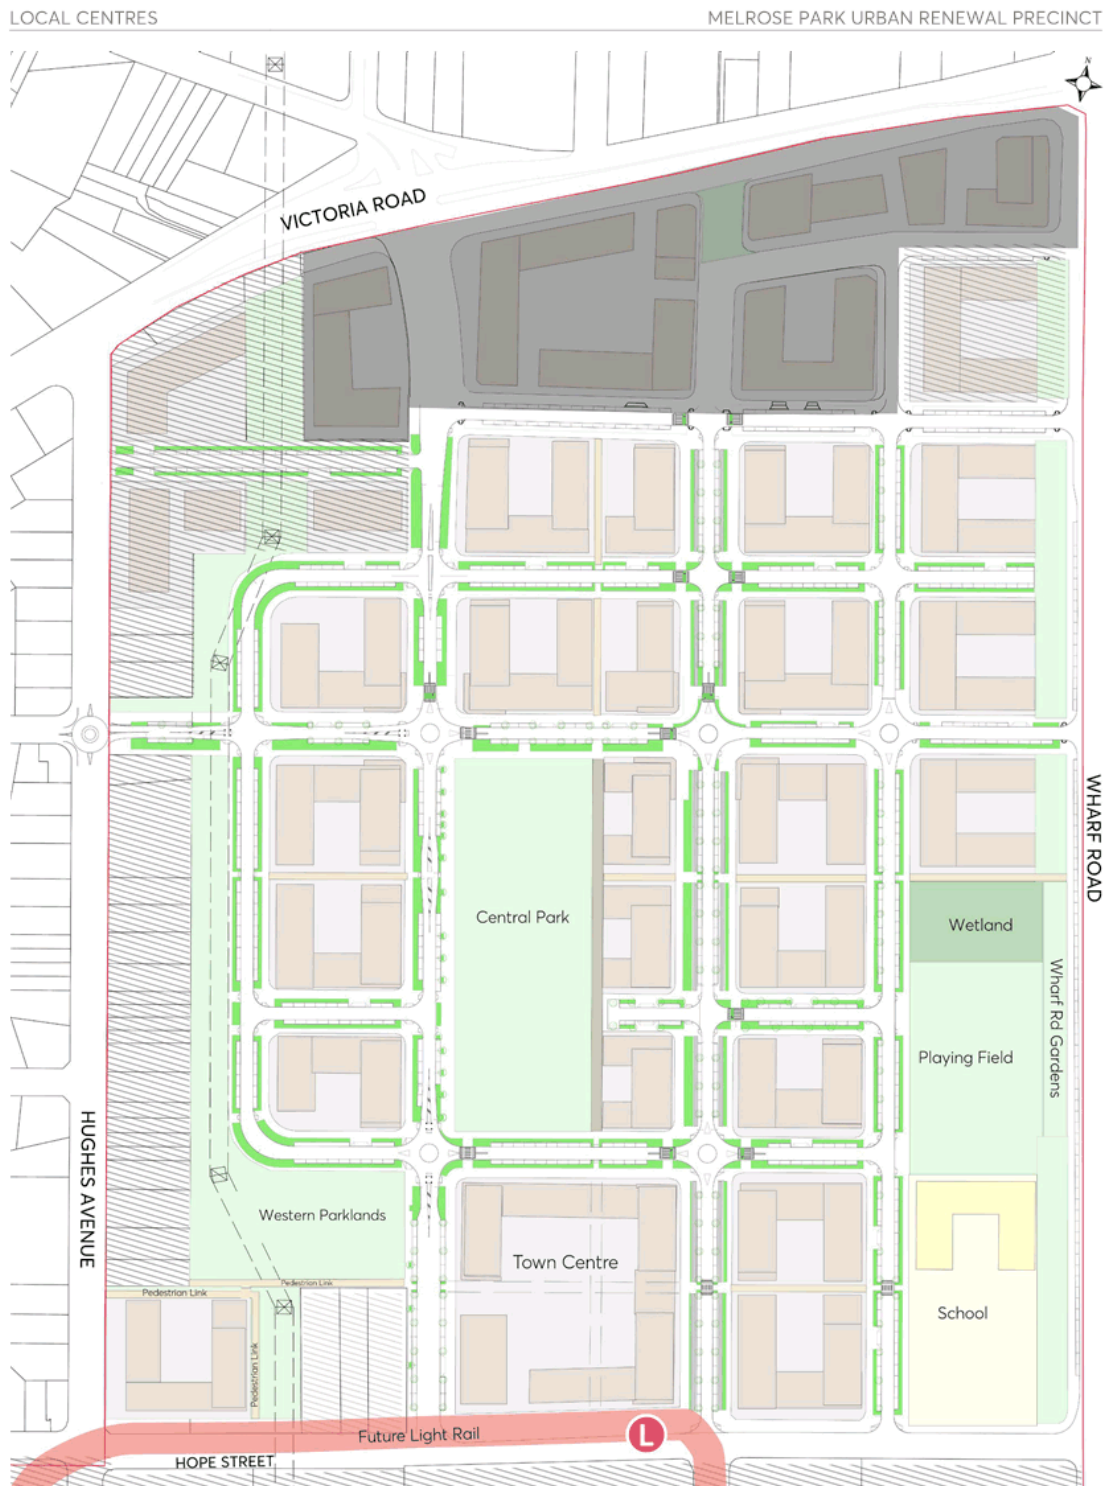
Public Domain Plan - Melrose Park North
